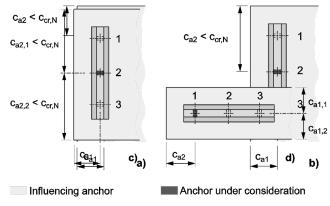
ANCHOR CHANNEL AT A CORNER OF A CONCRETE MEMBER
